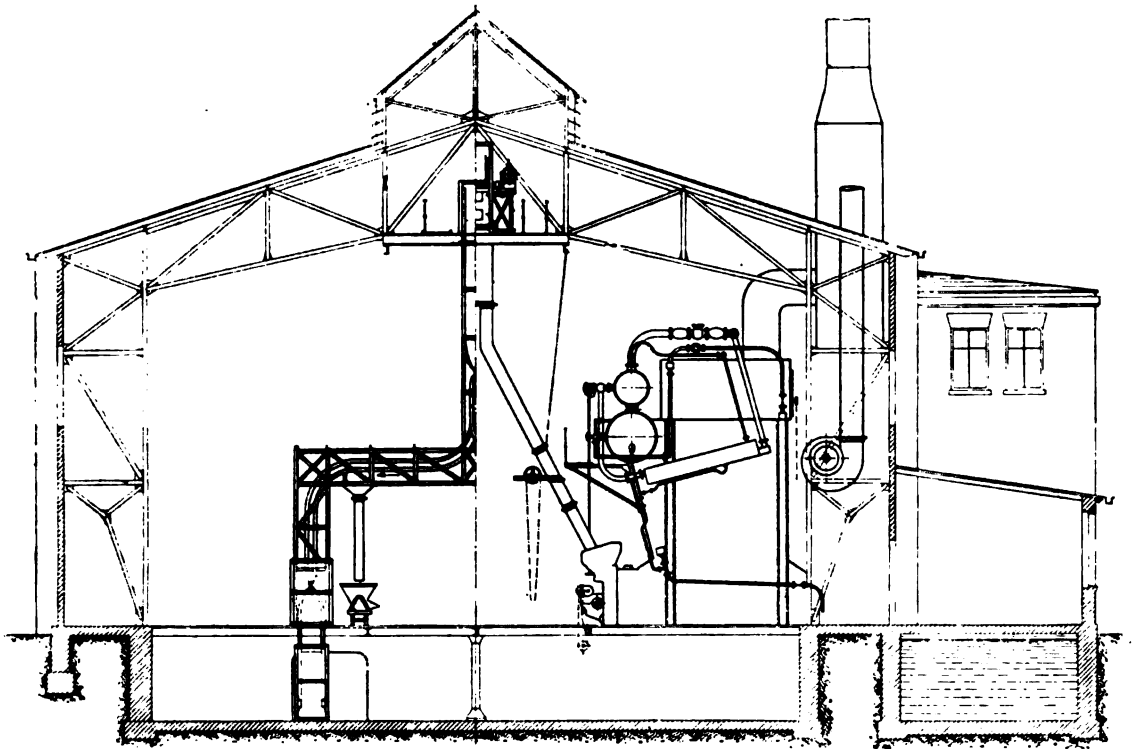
Section through Boiler House looking towards the Coal Yard.
